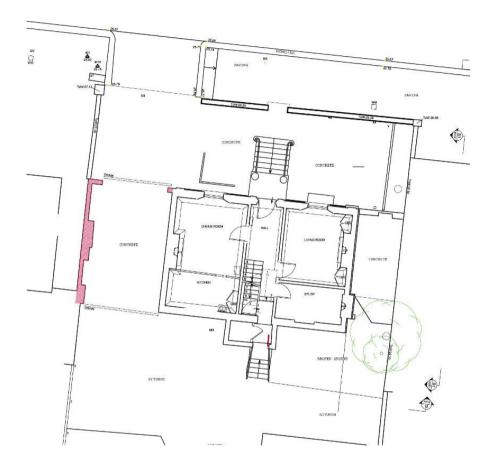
Plan of existing annex No 1c Hawley Road shown in red.
